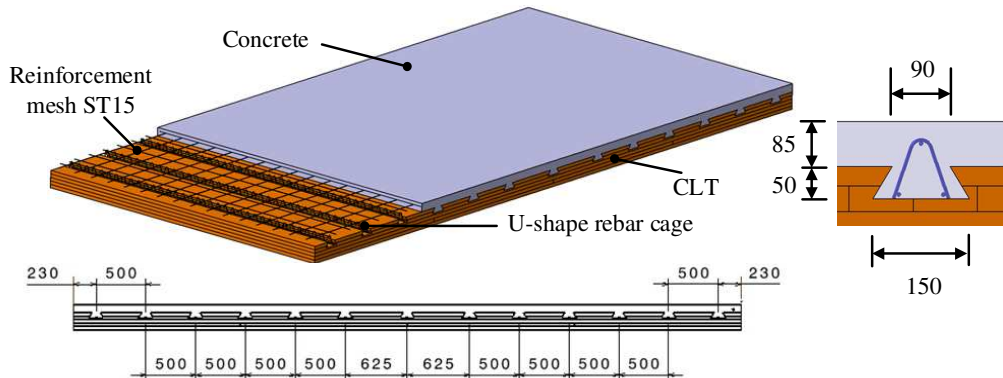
Flexural test: Description and dimensions of test specimen (dimensions in mm).
